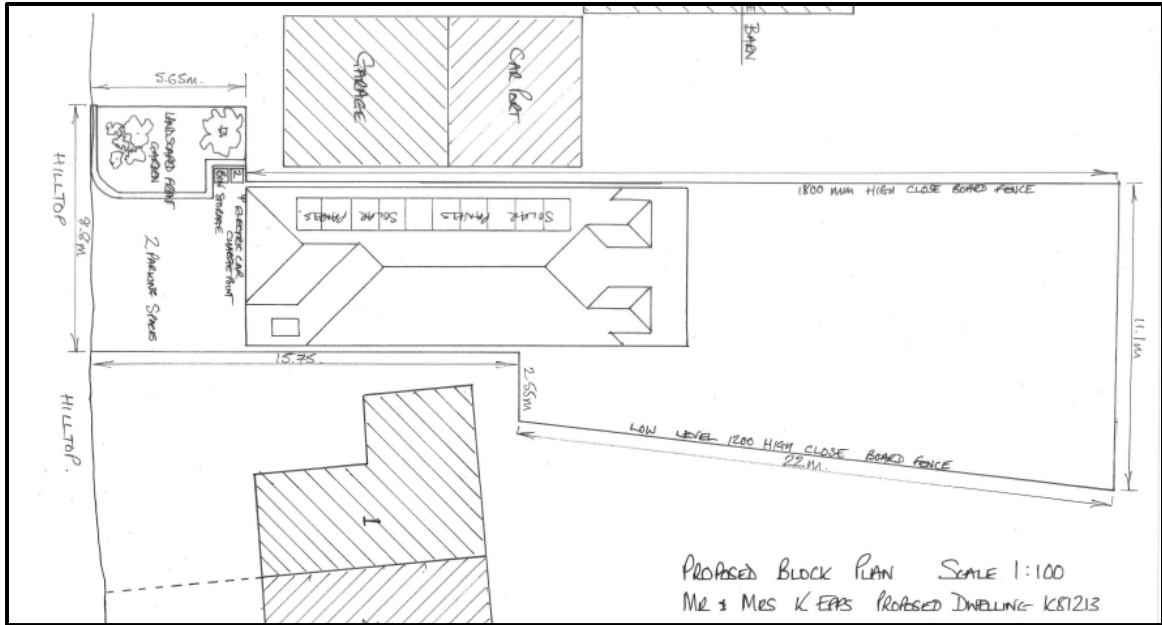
Extract of proposed block plan under reference 19/502247/FULL
